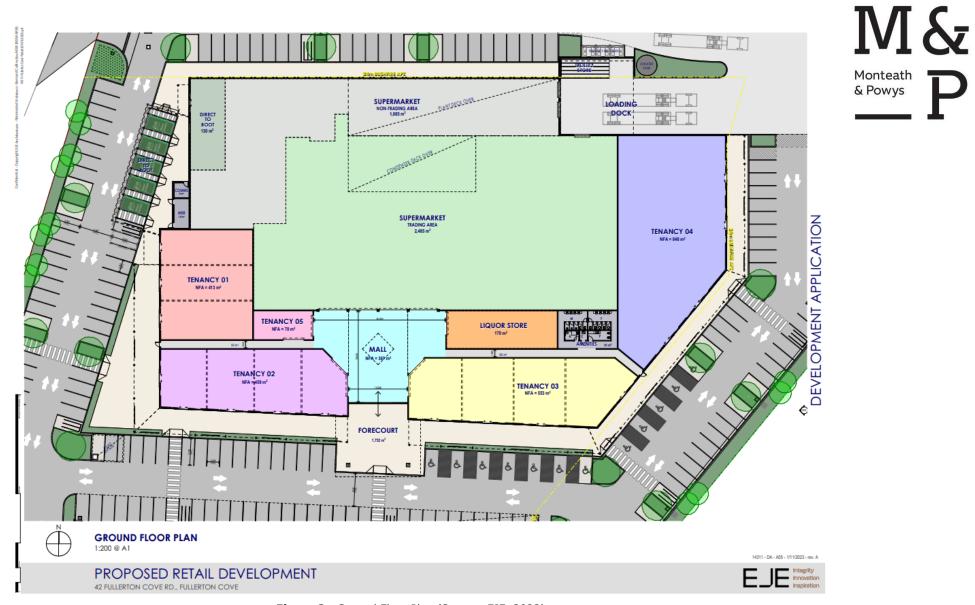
Ground Floor Plan (Source: EJE, 2023)
